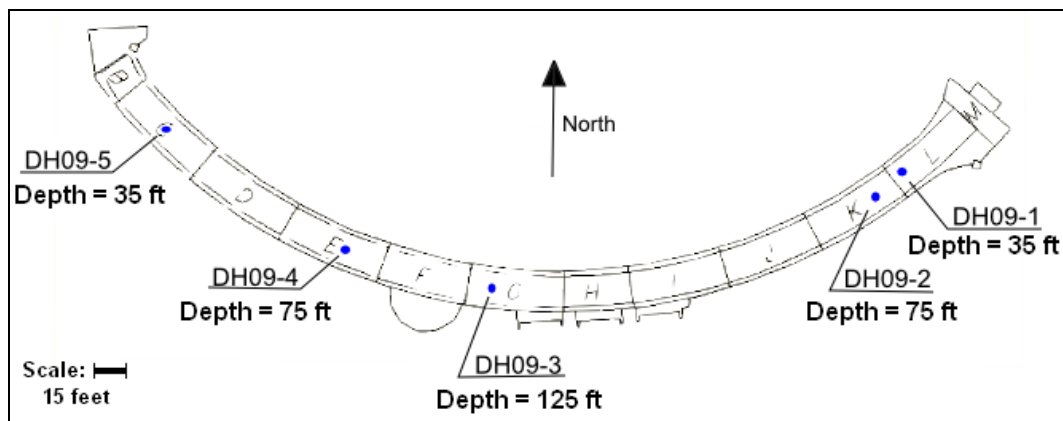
Plan view of the crest of Seminole Dam. For the purpose of indicating drill hole locations, naming scheme and depths.
